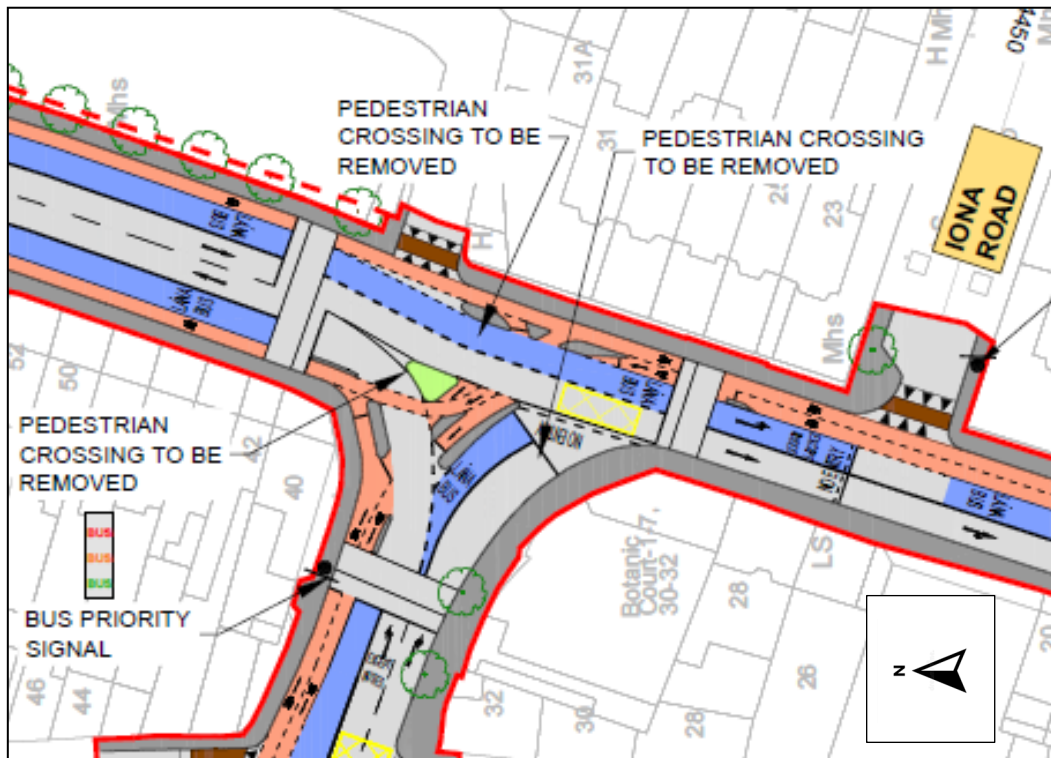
Extract from General Arrangement Drawing Sheet 12 at Botanic Road / Prospect Way Junction
